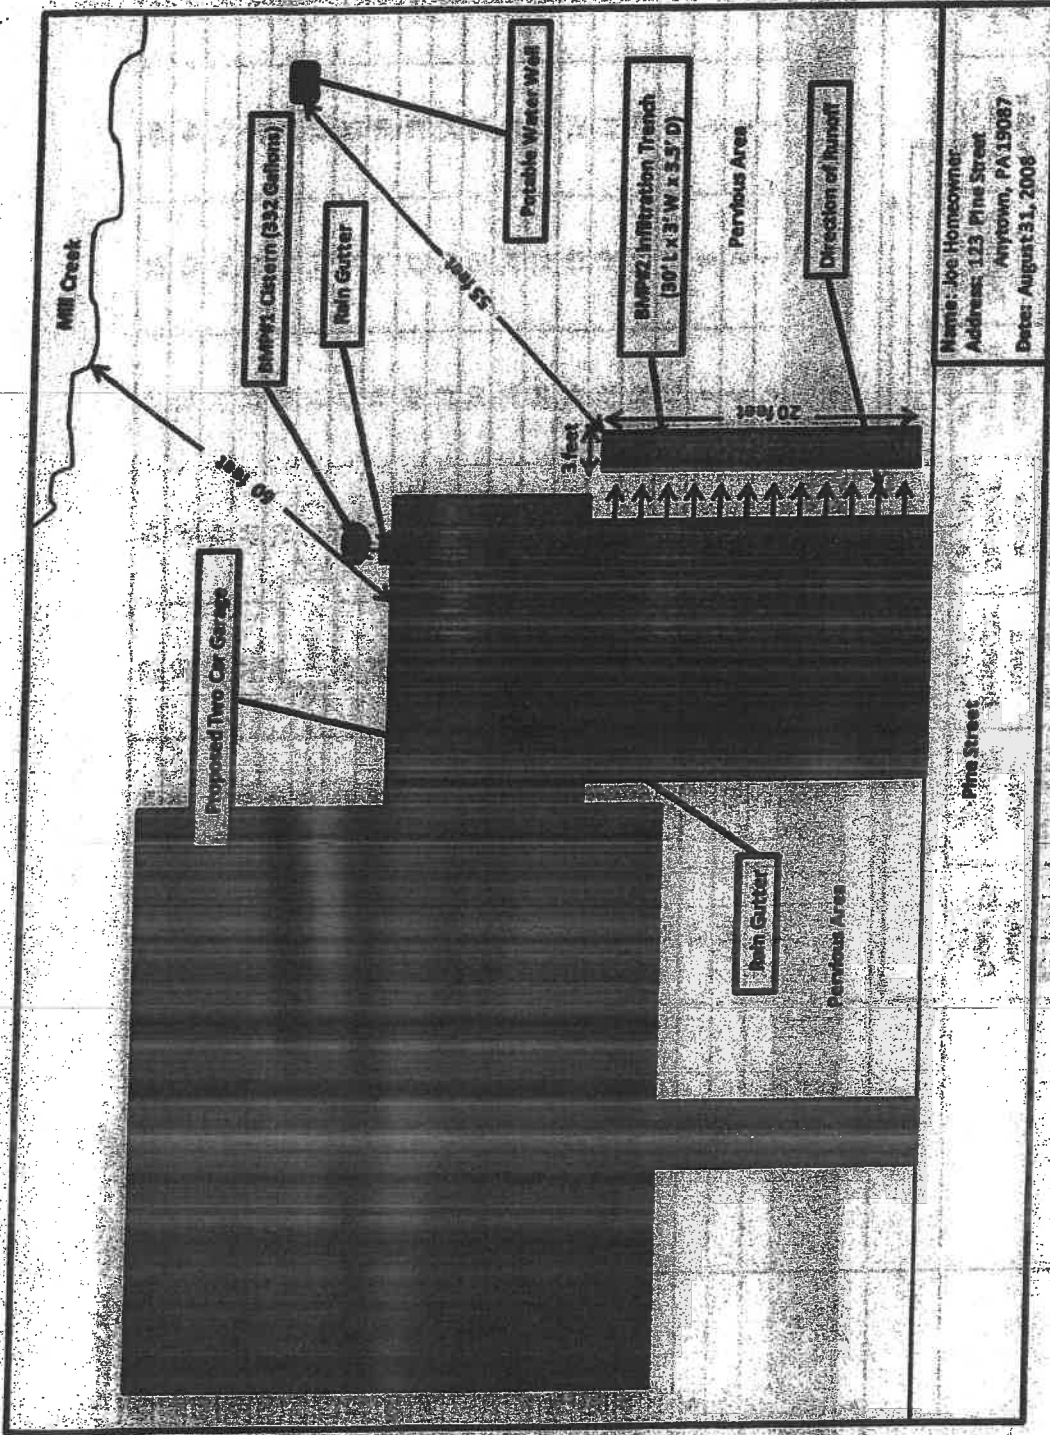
Example of Simplified Stormwater Management Site Plan for Joe Homeowner
